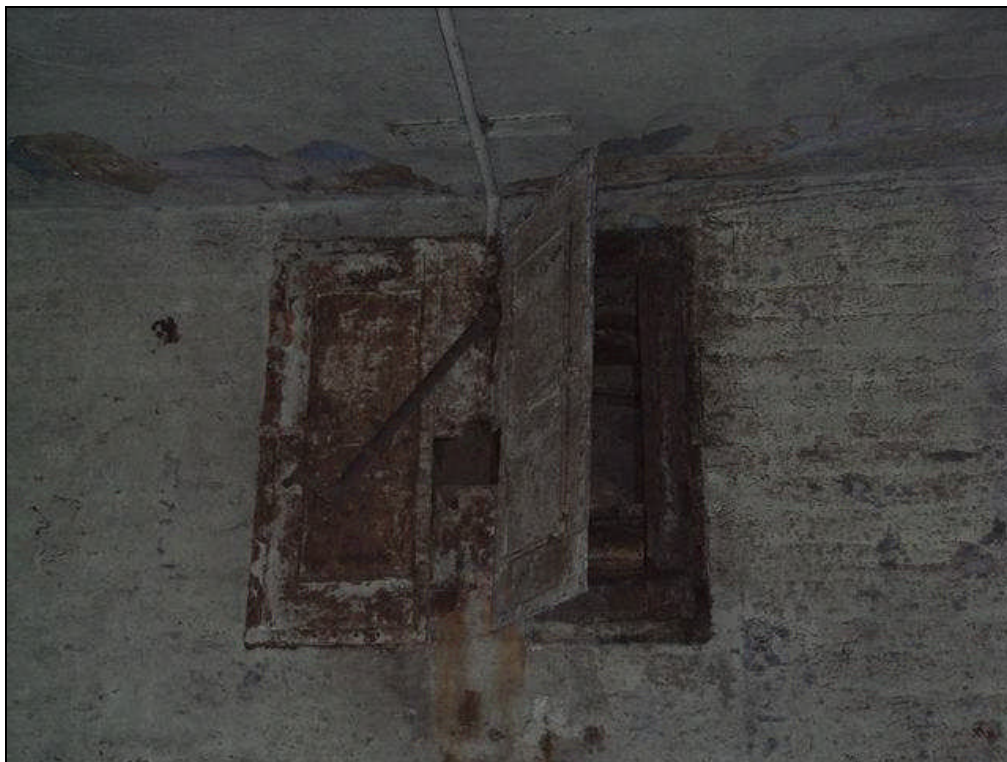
Cast iron wall box with shutters, ground floor interior, Building A
